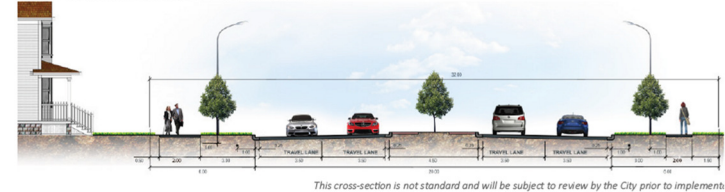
32.0m Divided Collector Roadway Cross-Section at Protected Parking
